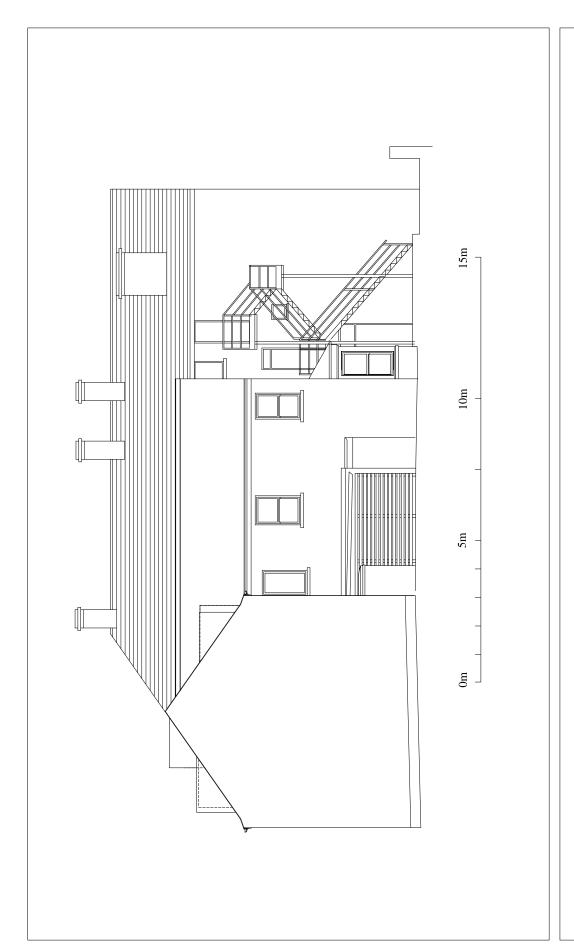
Prince of Wales, Caernarfon Existing North Facing Elevation. Produced by and © Pritchard Bond Architects, Bangor
